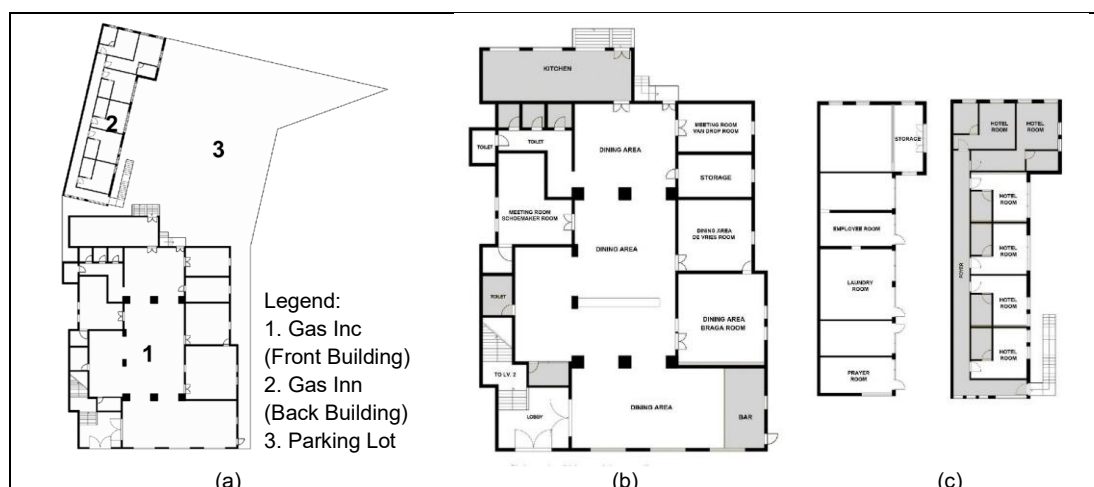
(a) Site Plan of Gas Block Hotel, (b) Plan of Front Building, (c) Plan of Back Building
